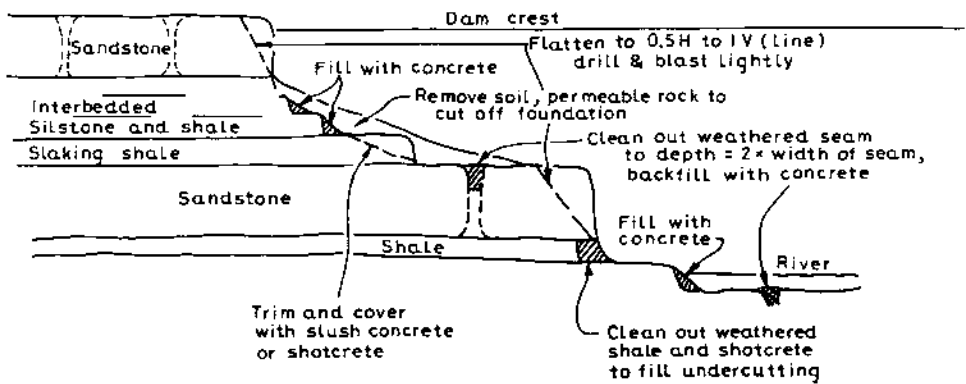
Slope modification in the cutoff foundation for interbedded sandstone and siltstone, near horizontal bedding.
